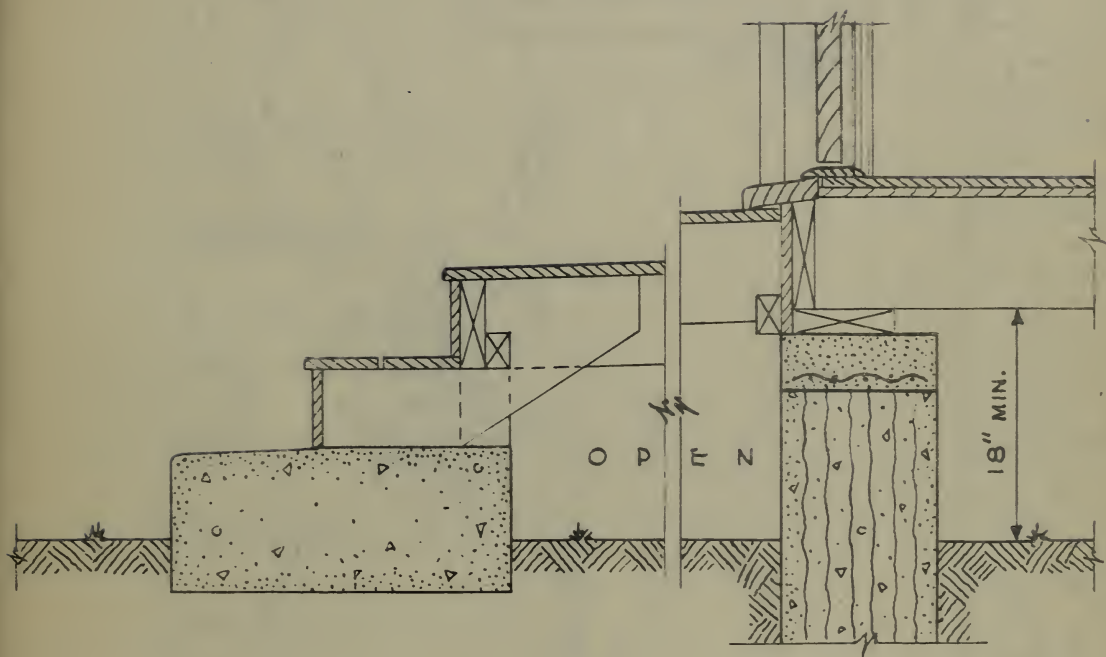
WOODEN STEPS OR PORCH protected from hidden infestation by resting carriage on a poured concrete base which forms the lower step. Platform attached to building above the poured concrete cap on foundation wall or pier.
